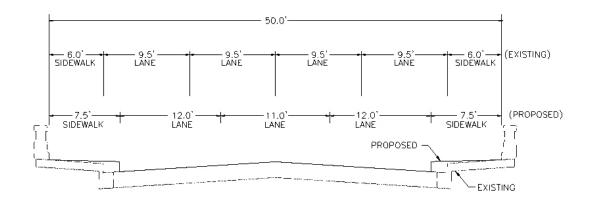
Existing and Proposed Typical Roadway Cross-Section
